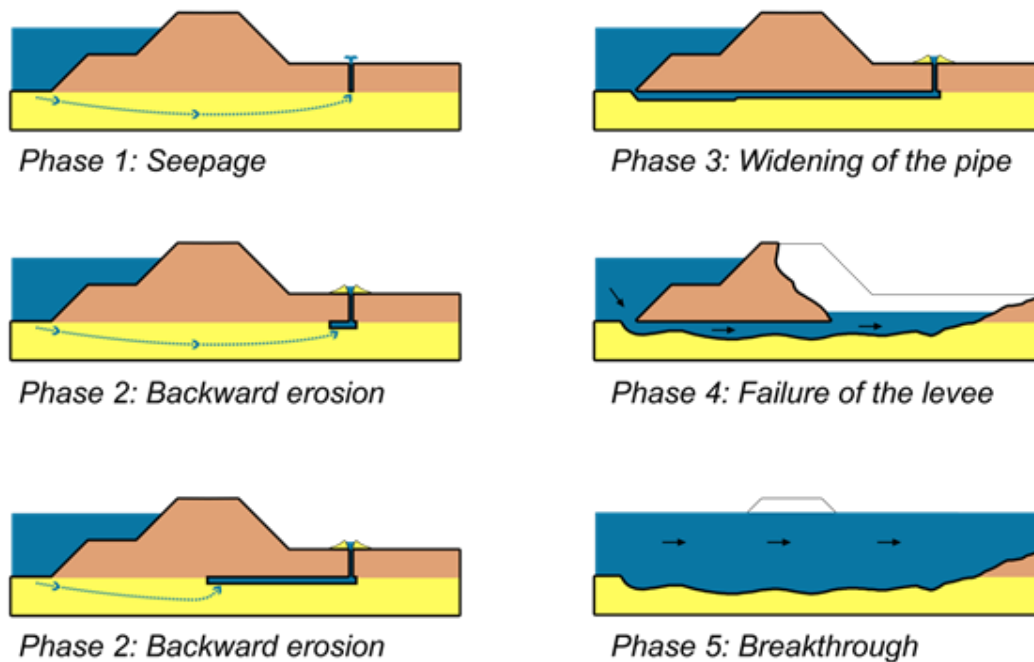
Backward Erosion Piping (adapted from van Beek et al. 2011)
